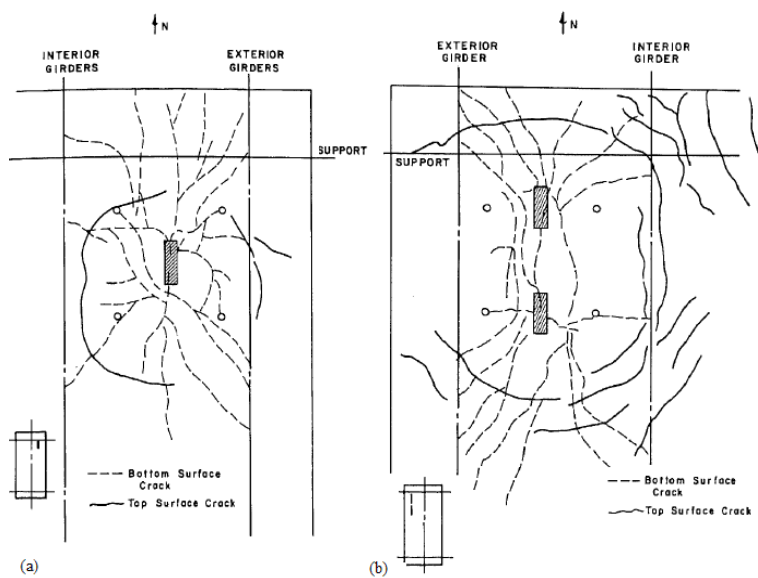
Deck cracking from (a) single load test and (b) tandem load test. (Fang et al., 1990)
